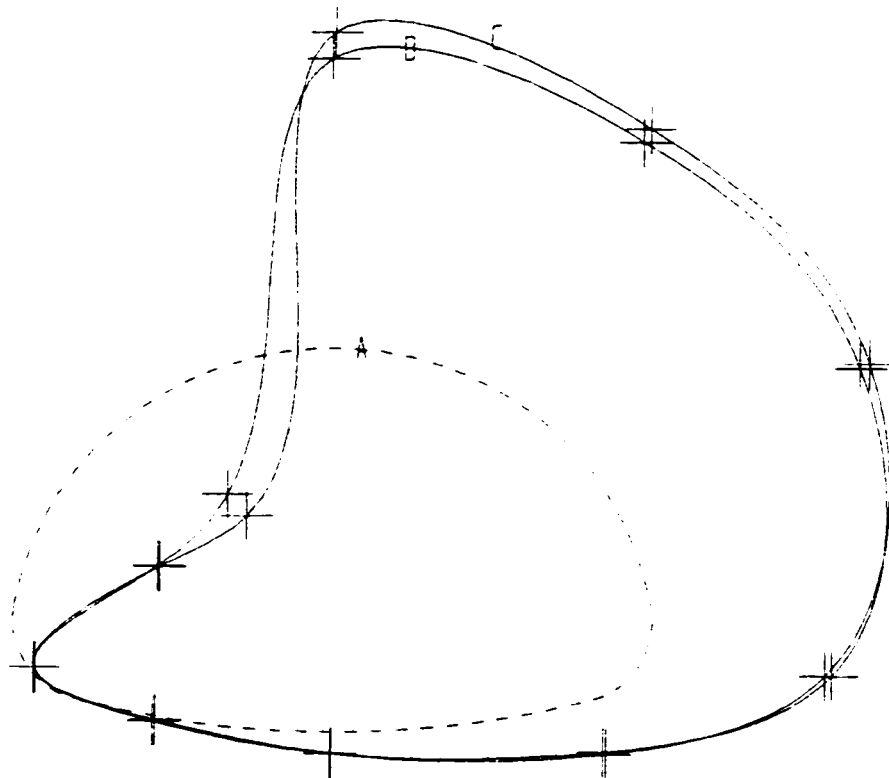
Deflected Shape for Pipe-Arch - Uneven Soil Failure
